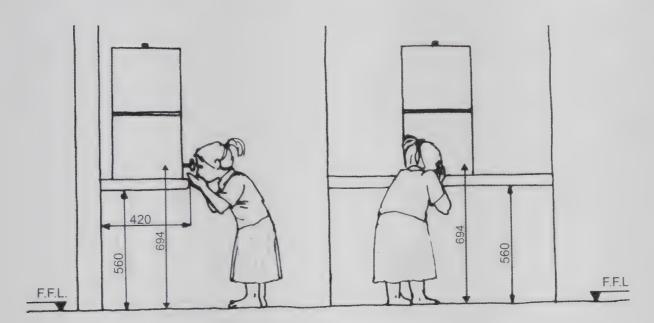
27a. Elevation Hooks at different heights for water dispenser cup Chain to secure glass Earthen pots F.F.L. Finished floor level
